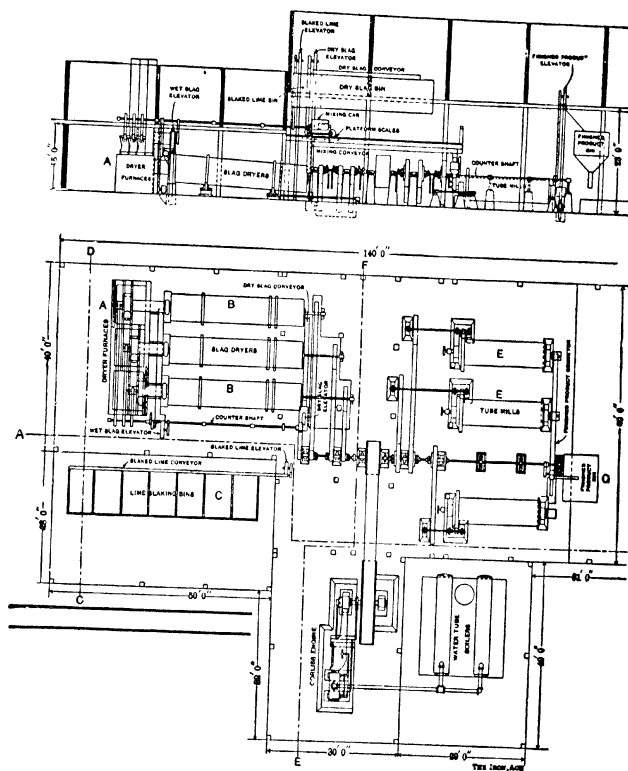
Elevation and plan of Stewart slag-cement plant (The Iron Age)
